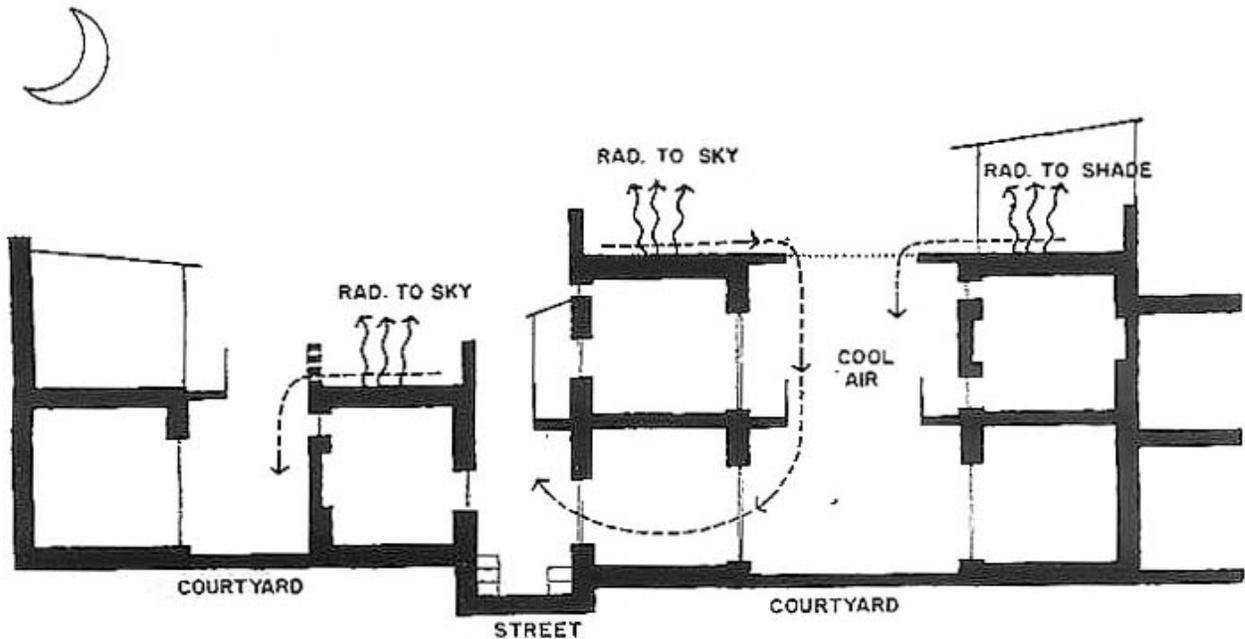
Typical section through Shahjahanabad House. To Facilitate the moment of cool air into the house, parapets are not built towards the courtyard
